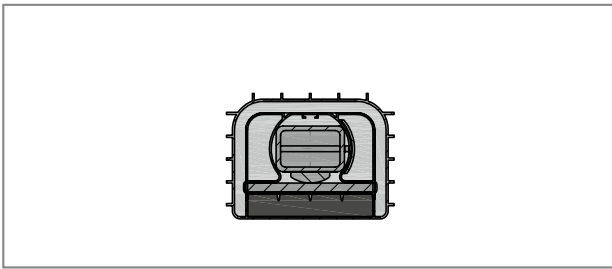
Schöck Tronsole® type Q: Installation variant horizontal installation of the load-bearing element
